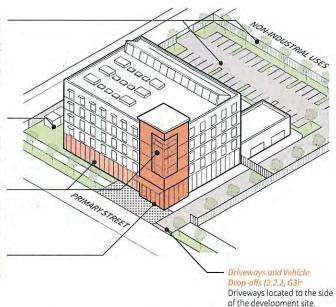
R&D Facilities in Growth Areas - An industrial or commercial R&D development within General Plan Growth Area designed with the building located close to the primary street edge, special corner treatment, primary building entrance accessible from the public realm, and all parking located towards the rear of the site.
